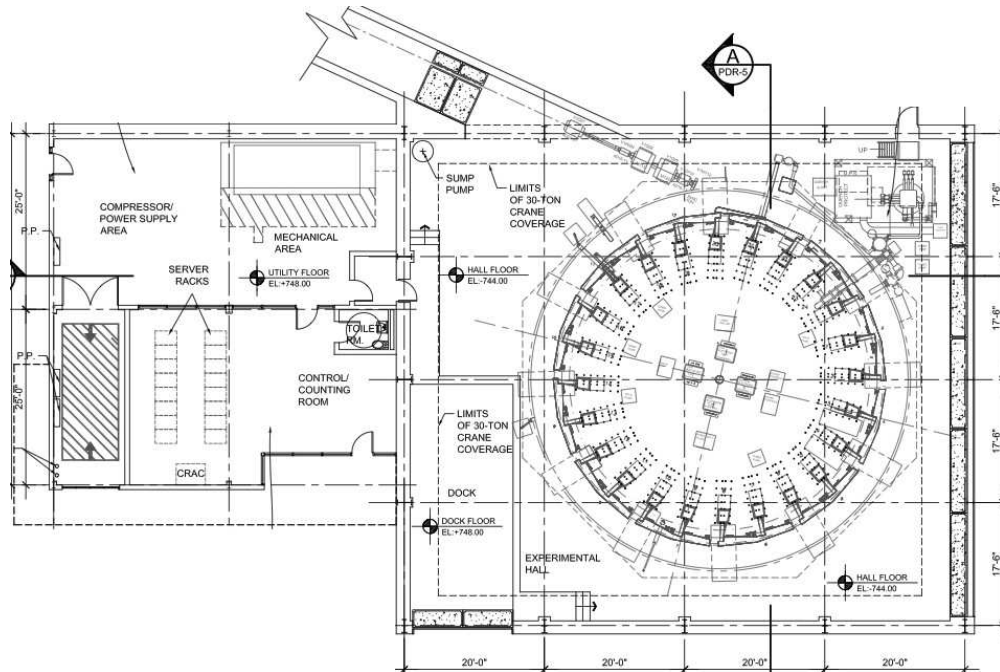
Architectural floor plan of the  $g-2$  conventional facilities.
